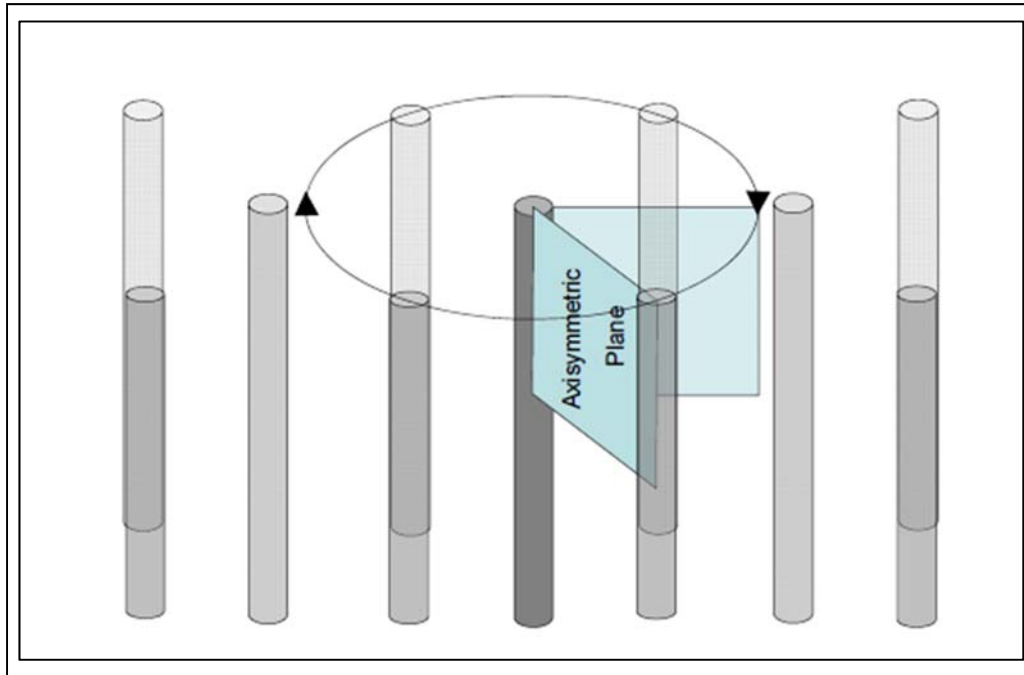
Typical DSM Column Arrangement (Tatarniuk, 2014)
